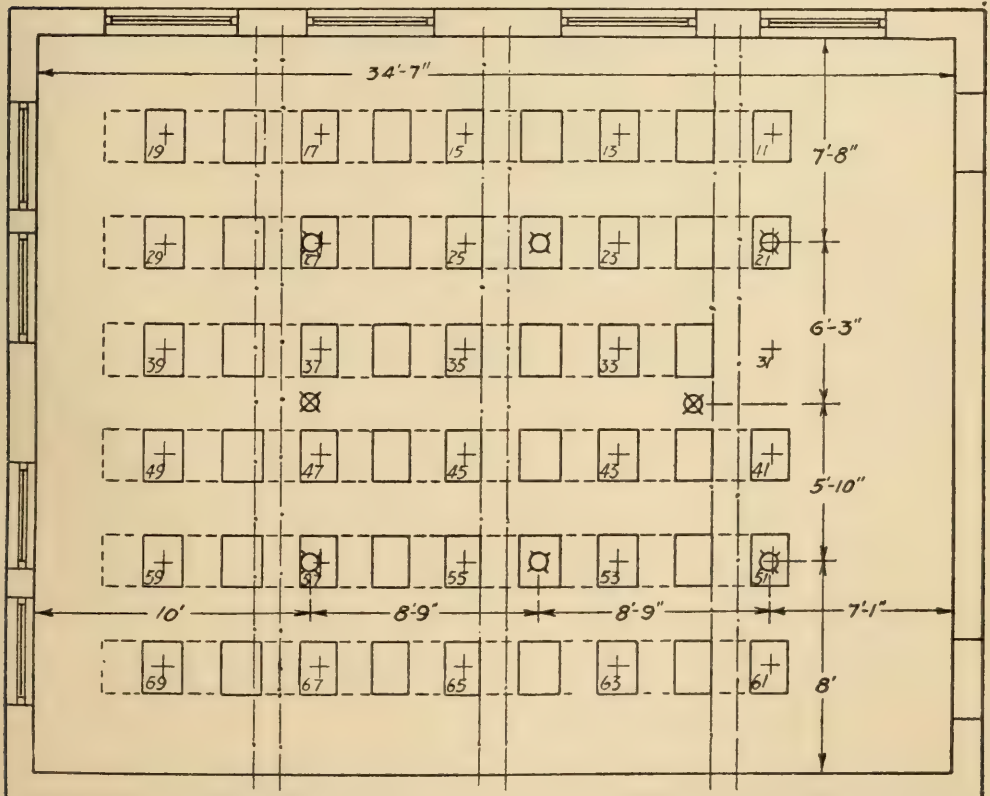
(c).—Old (⊗) and new (⊘) outlets for artificial lighting equipment in a classroom.
